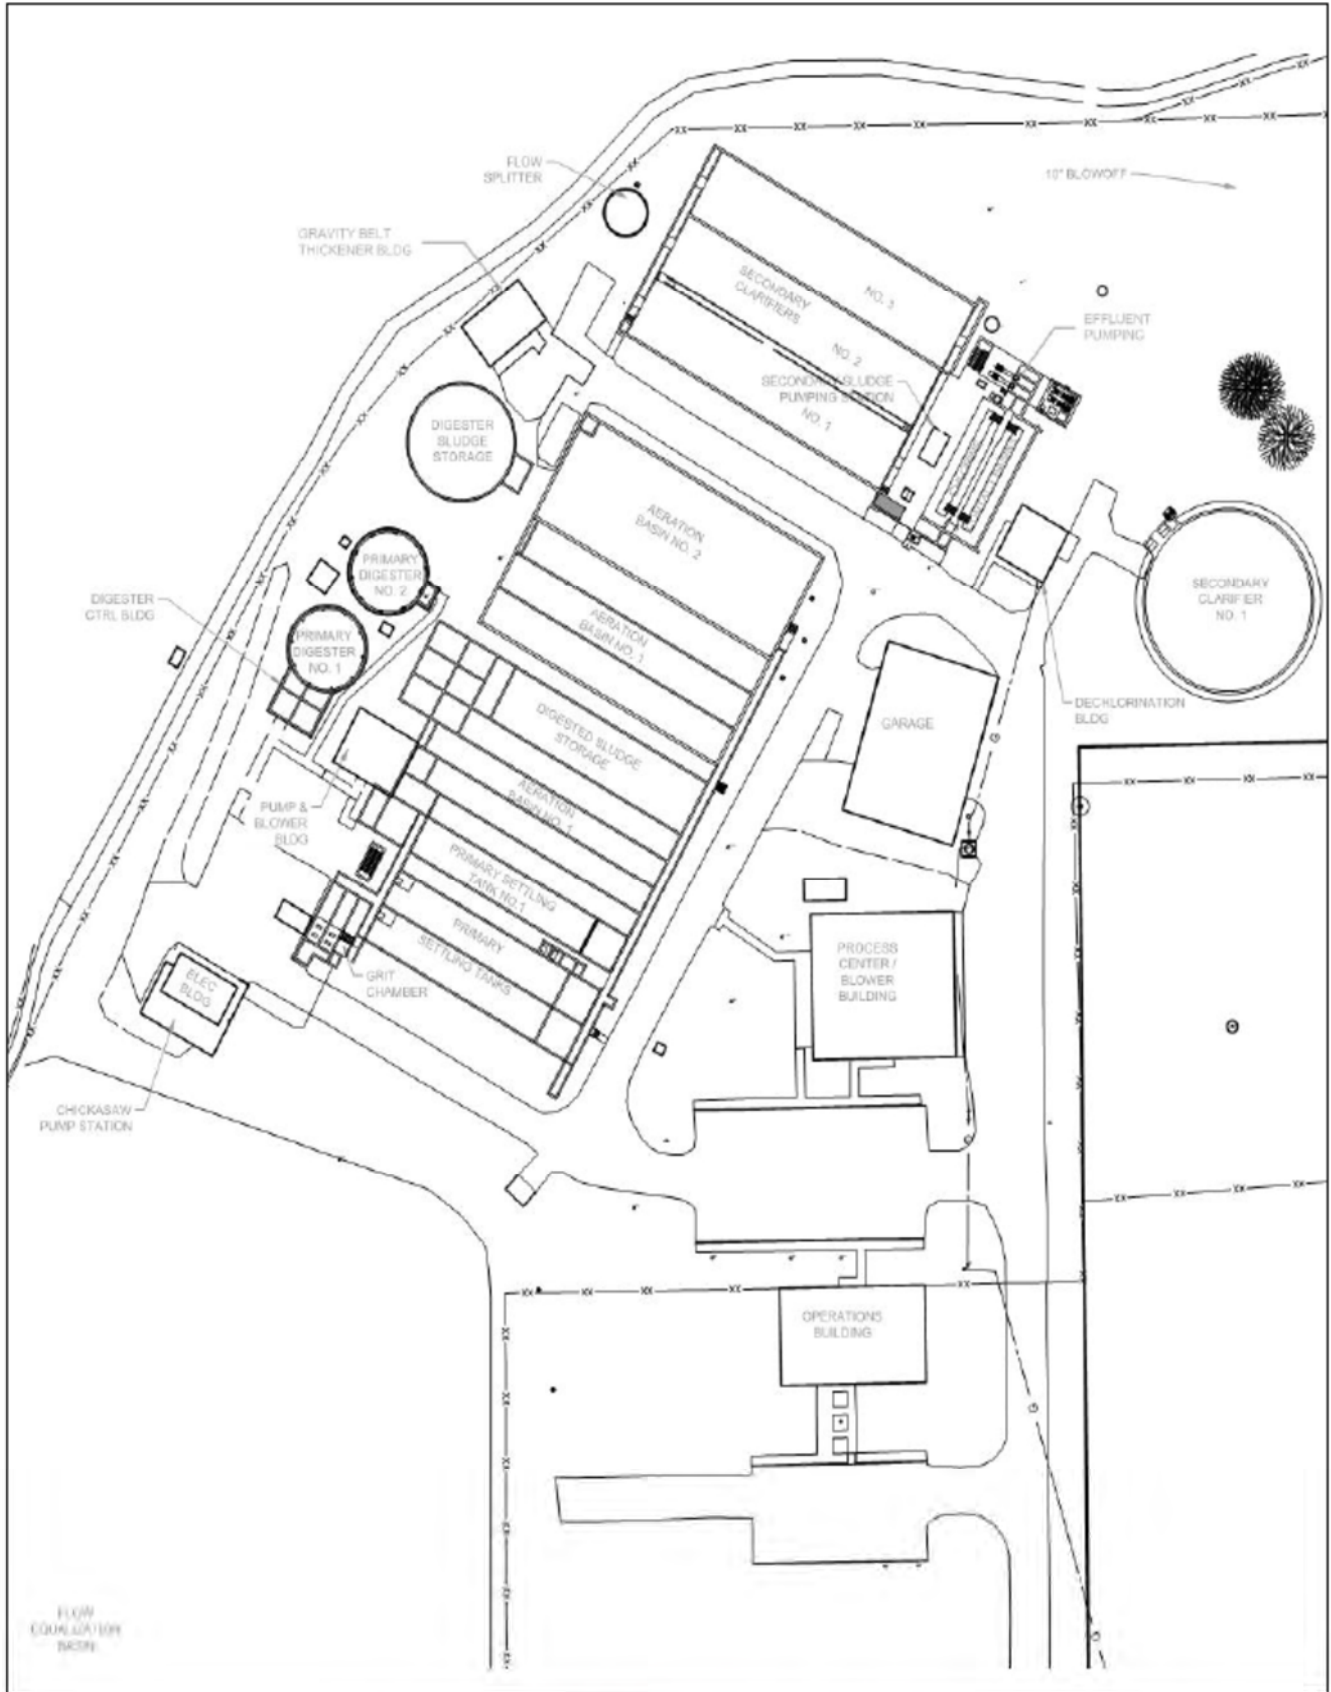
Chickasaw WWTP Site Plan - Existing
